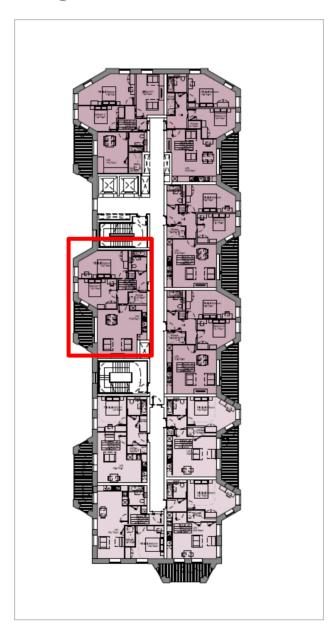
Block B, 2nd floor selected middle floor 2bed dwelling facing west (Patel Taylor drawings 21.09.2020).
